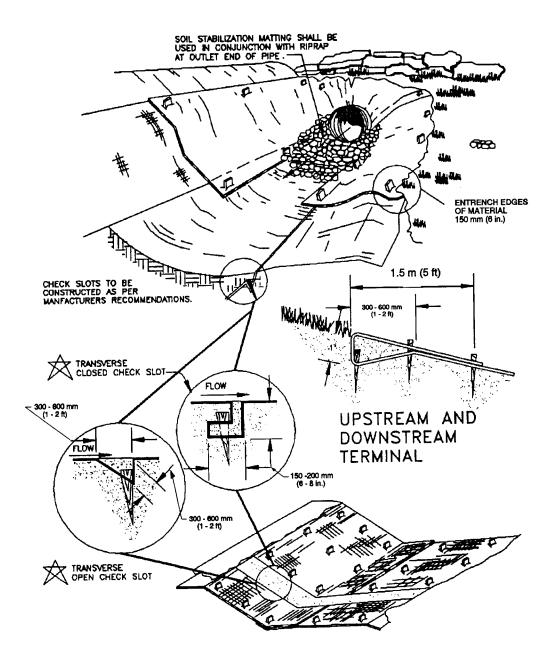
TYPICAL TREATMENT-2 SOIL STABILIZATION MATTING SLOPE INSTALLATION
